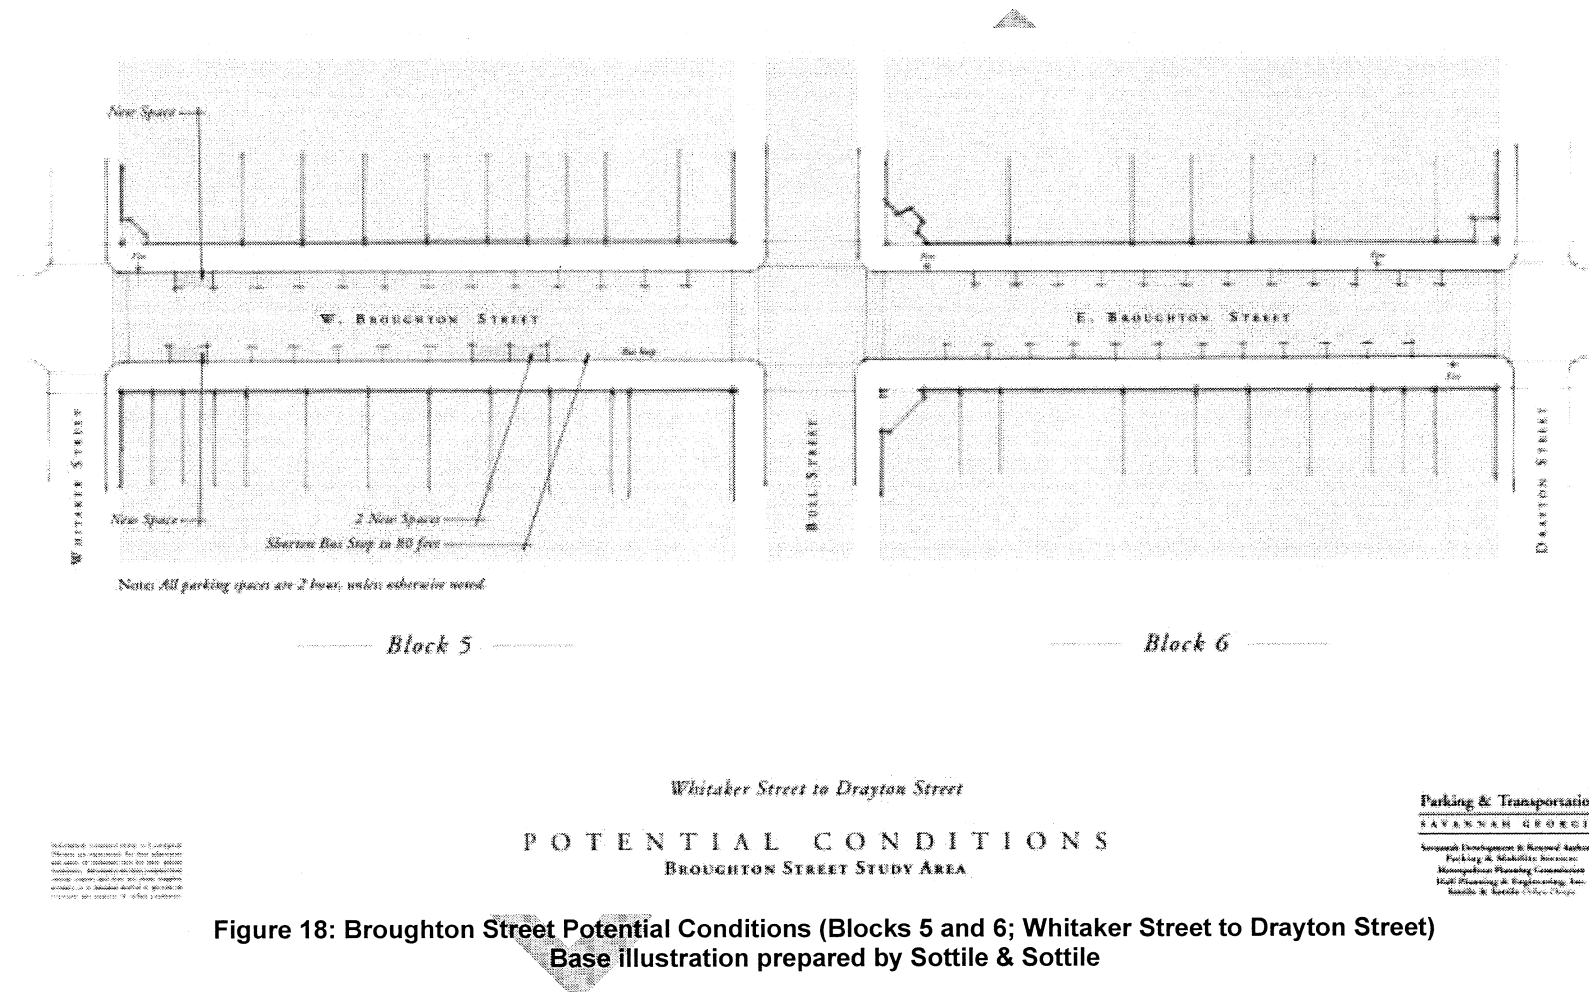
Broughton Street Potential Conditions (Blocks 5 and 6; Whitaker Street to Drayton Street)
